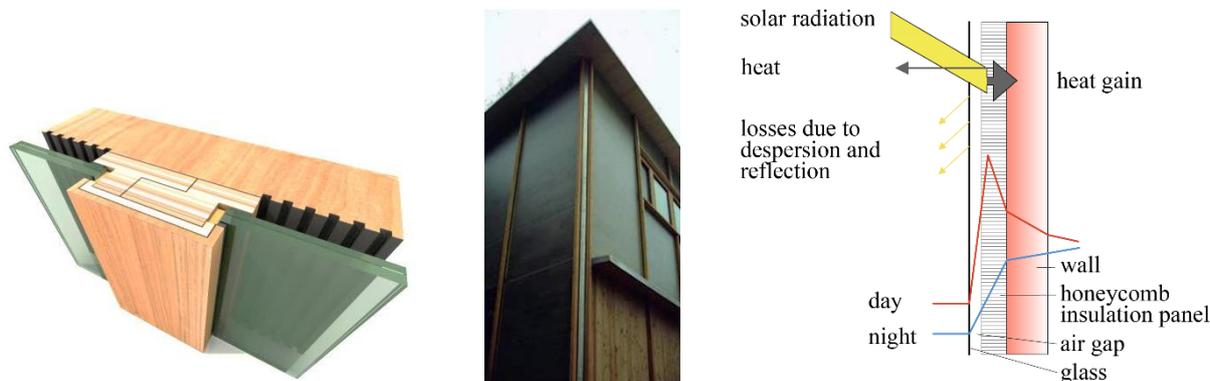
Examples of bonded TGC -outer skins of small wooden buildings
